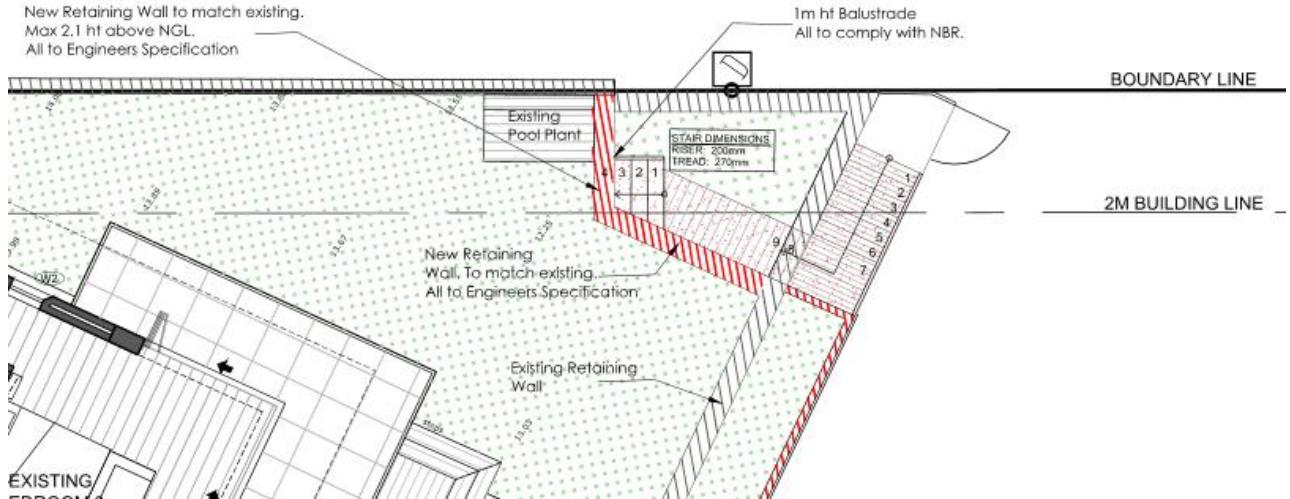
Second storey plan - retaining wall, canter lever planter and balustrade
